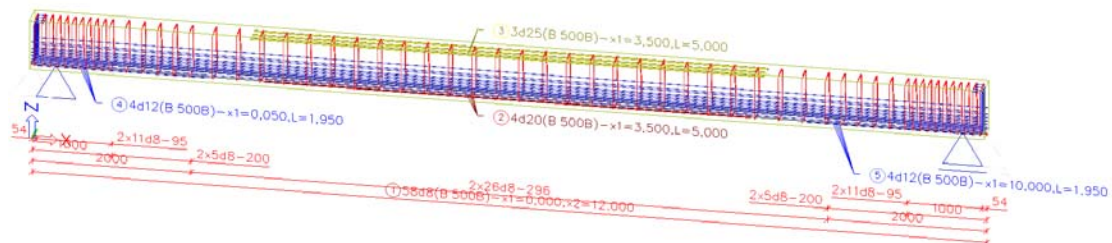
Example of a precast, prestressed beam in Scia Engineer, including the predefined stirrups and detailing reinforcement.
